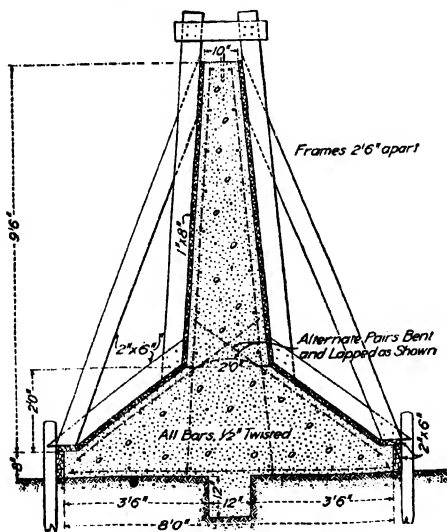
Retaining wall form, C. B. & Q. R. R.
